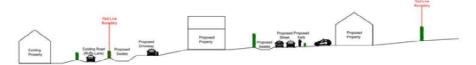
Site Section Plan for the previous outline application 17/00894/MOUT
